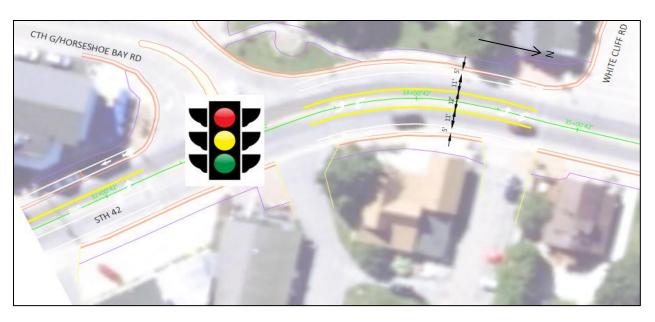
Aerial view for the intersection of STH 42 & Horseshoe Bay Road.
